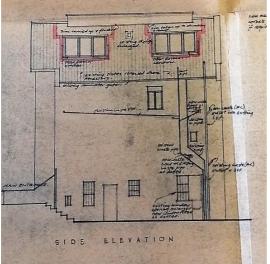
Drainage record from 1915 showing the ground floor level of the house.
